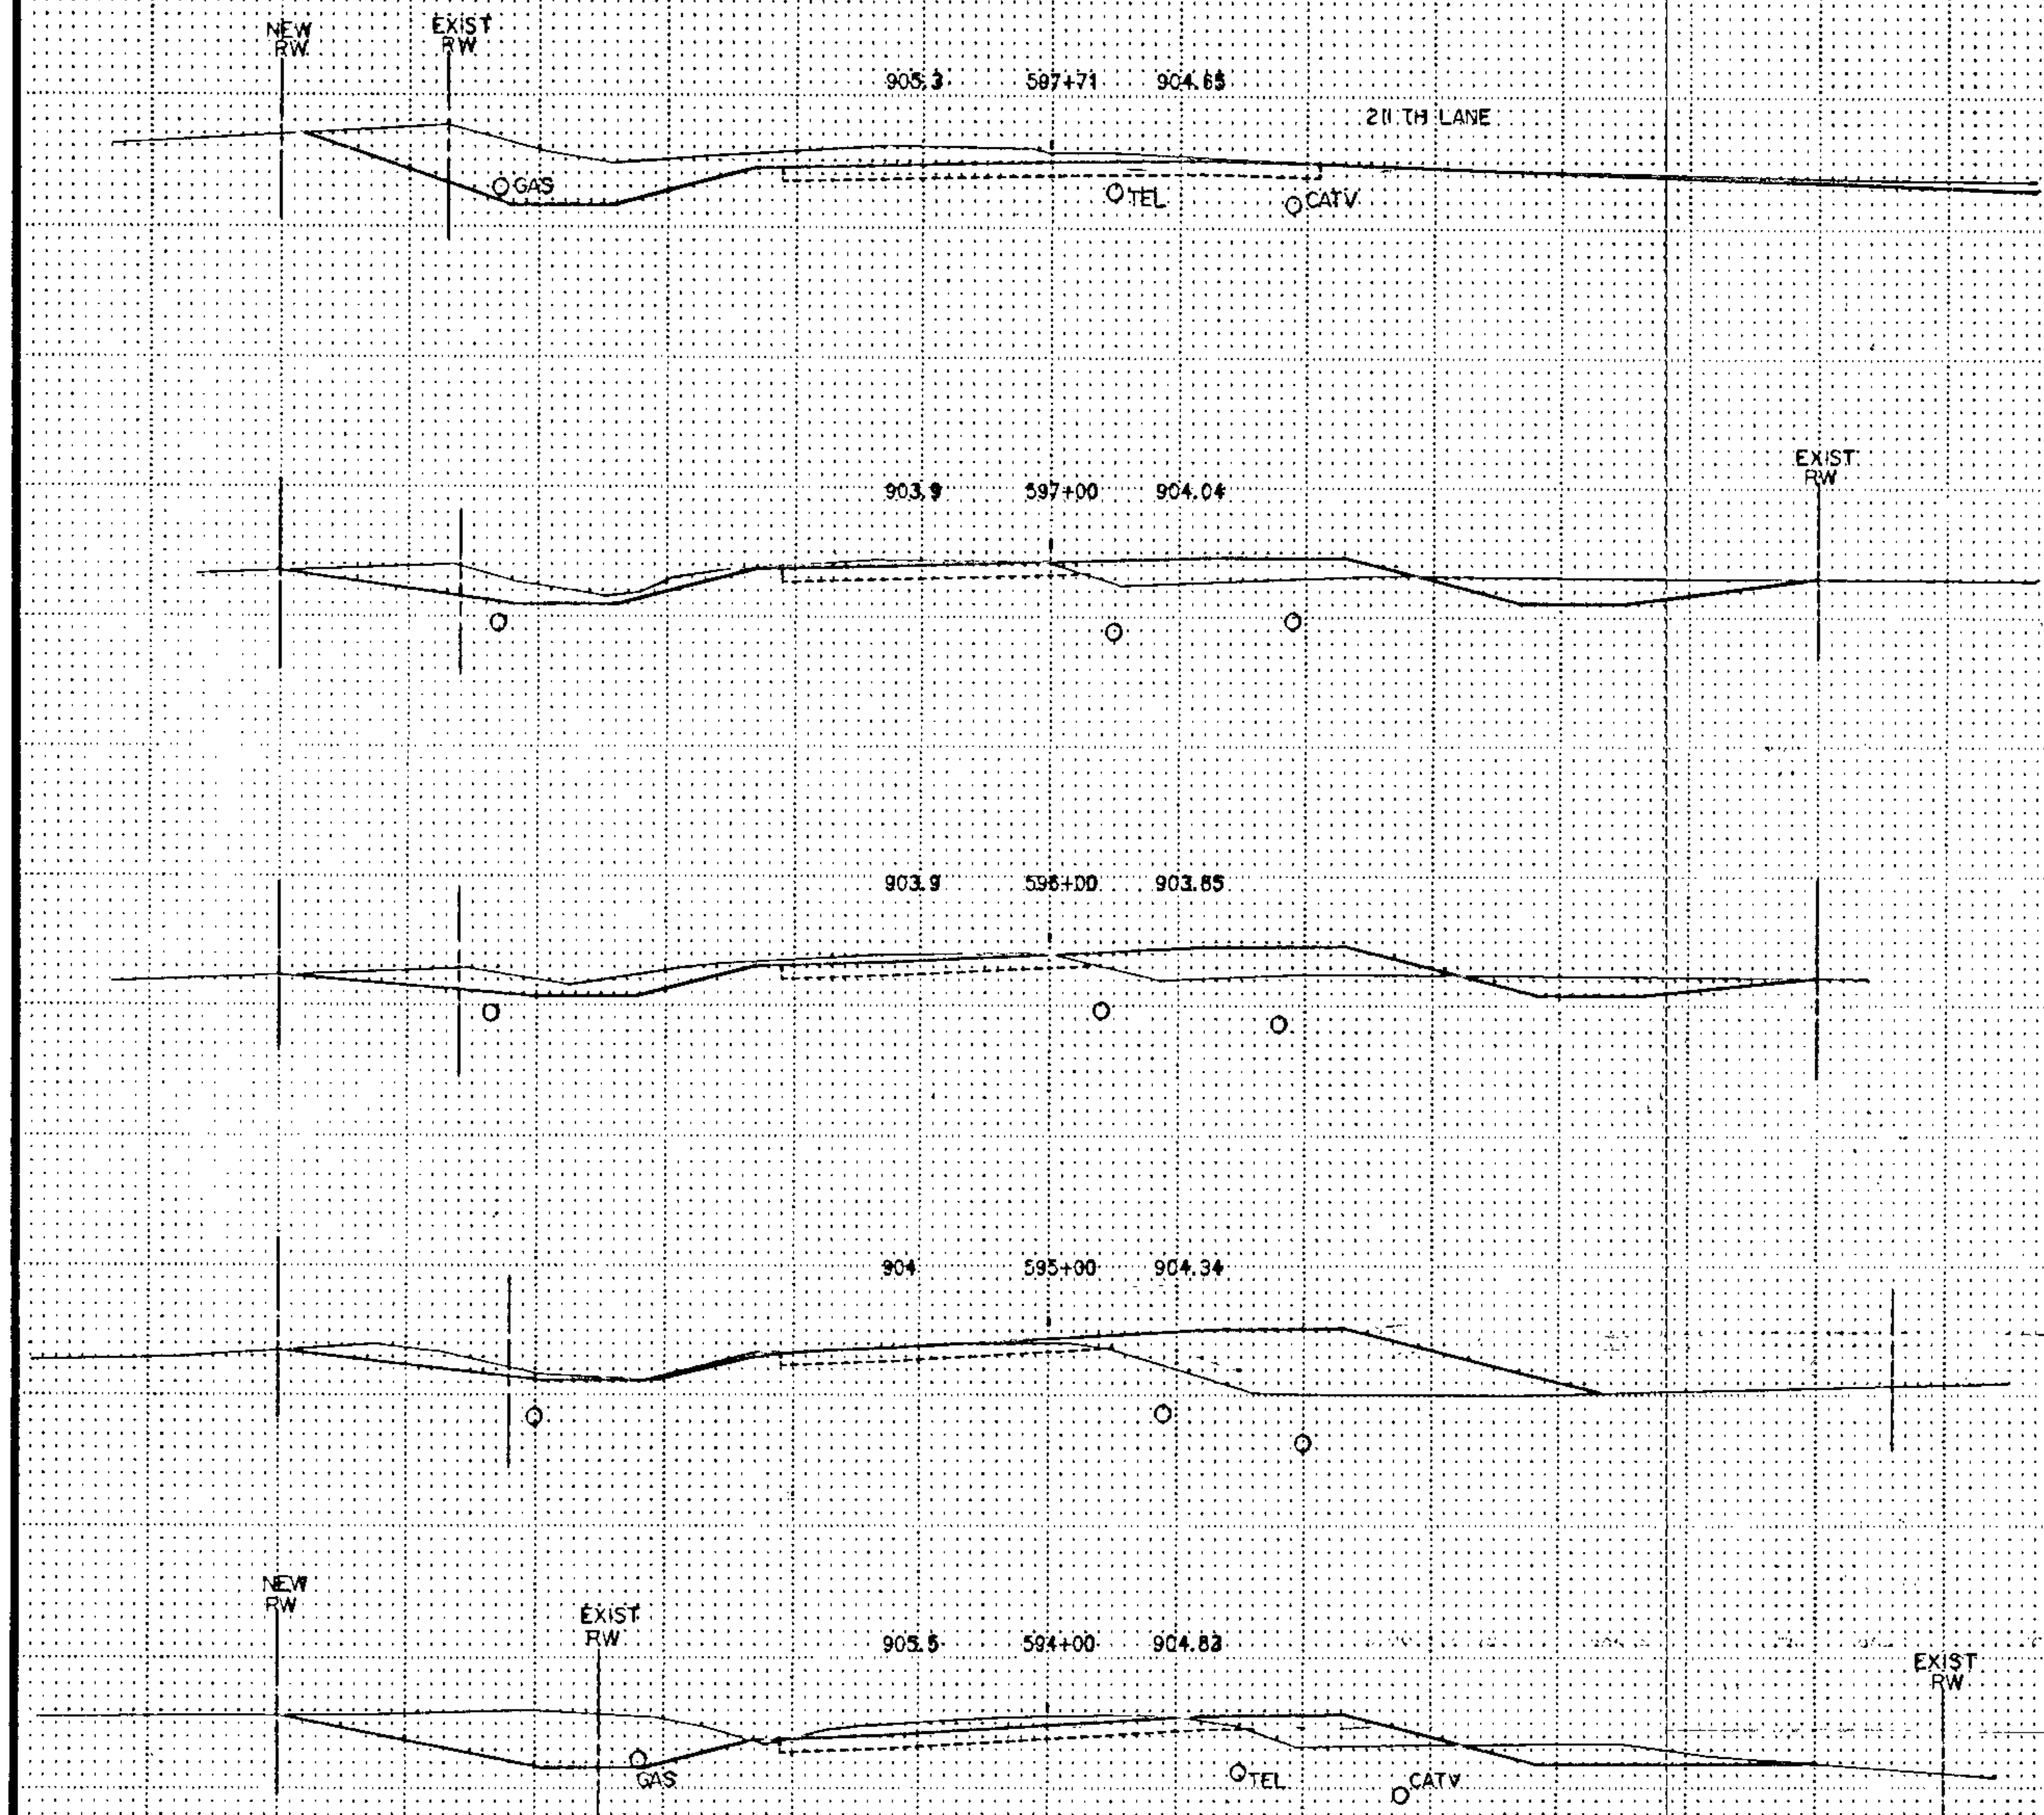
Full Cross Section DOTTED Clear Forme Weld Plus 30V
